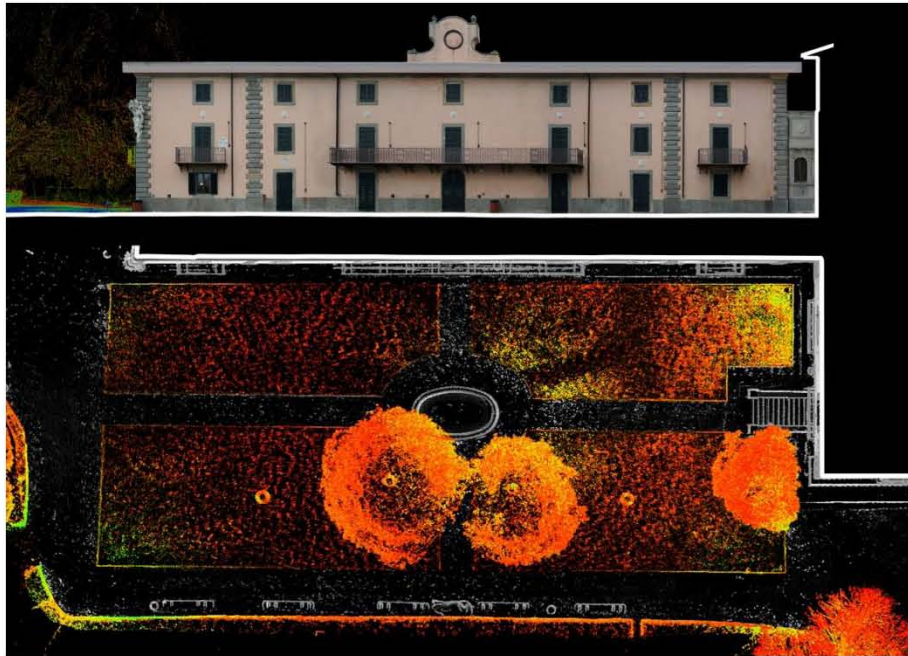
Plan and elevation of the Paggeria. Rectified image and point cloud.
